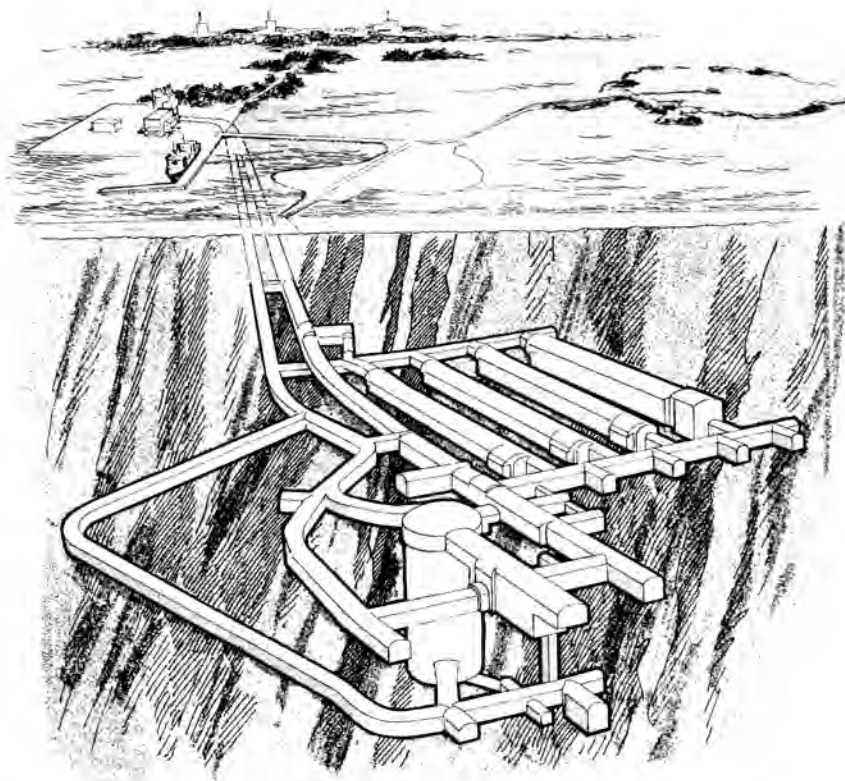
General Plan of the Repository with Tunnels and Caverns Built During the First Construction Phase.
